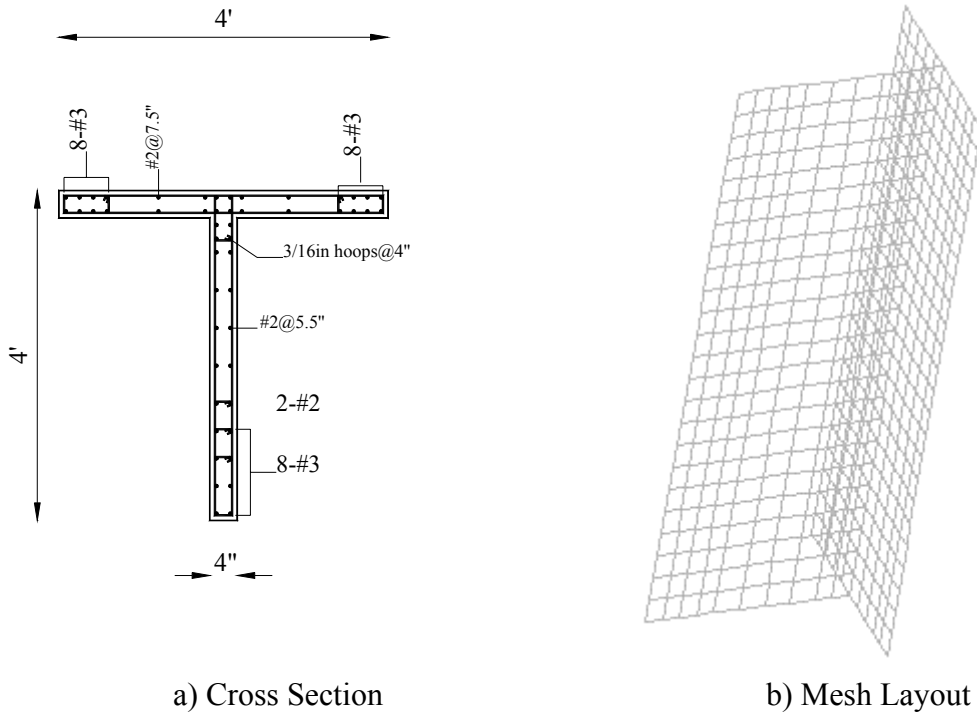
Cross Section and Mesh Layout for Wallace (1996) wall
